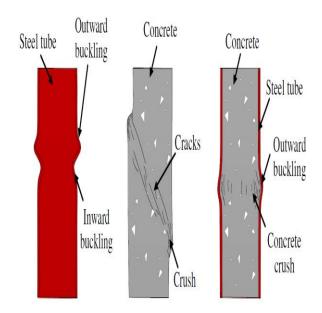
Schematic failure modes of hollow steel tube, concrete and CFST stub columns.
